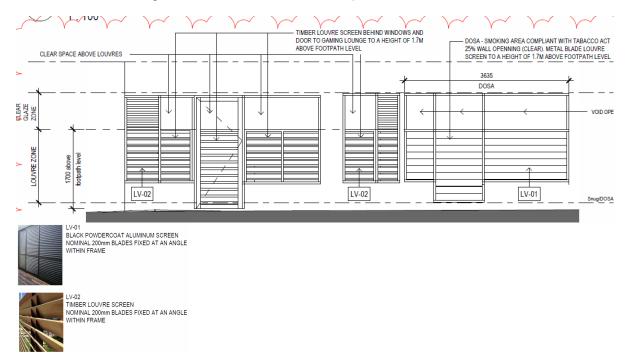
Extracts from the Discussion Drawings dated 19 May 2022 showing the revised treatment to the gaming lounge and DOSA
